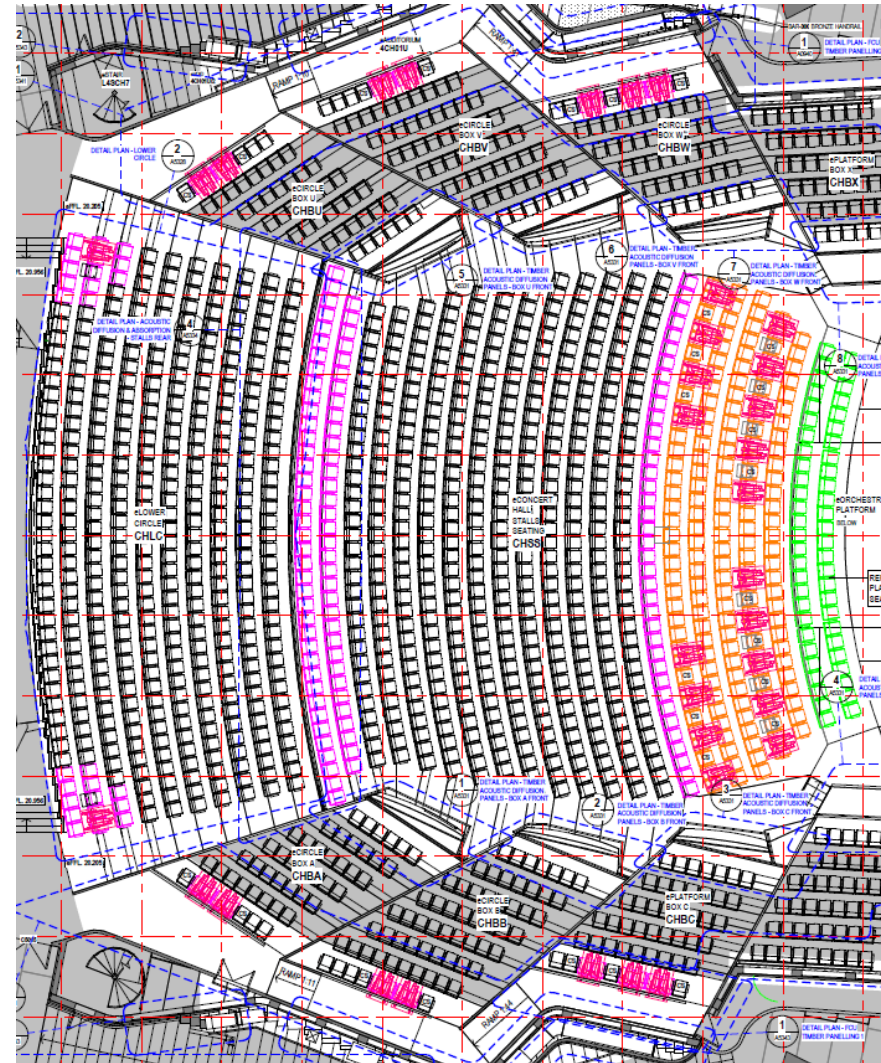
Plan of the Concert Hall Locating the accessible seating locations
